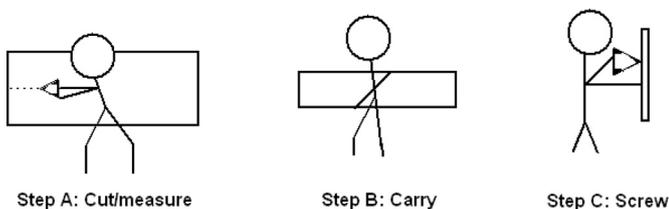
Schematic diagram for installation of a partial drywall sheet. Cut/measure: "Worker uses both cutter and tape measure to cut the whole drywall sheet into pieces that fit the structure"; carry: "Worker moves the drywall sheet with walking"; and screw: "Worker uses powered screwdriver to drive screws in to fasten the structure".
